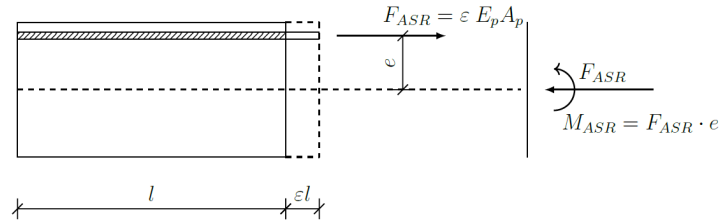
Expansion of reinforced concrete beam due to ASR [2]
